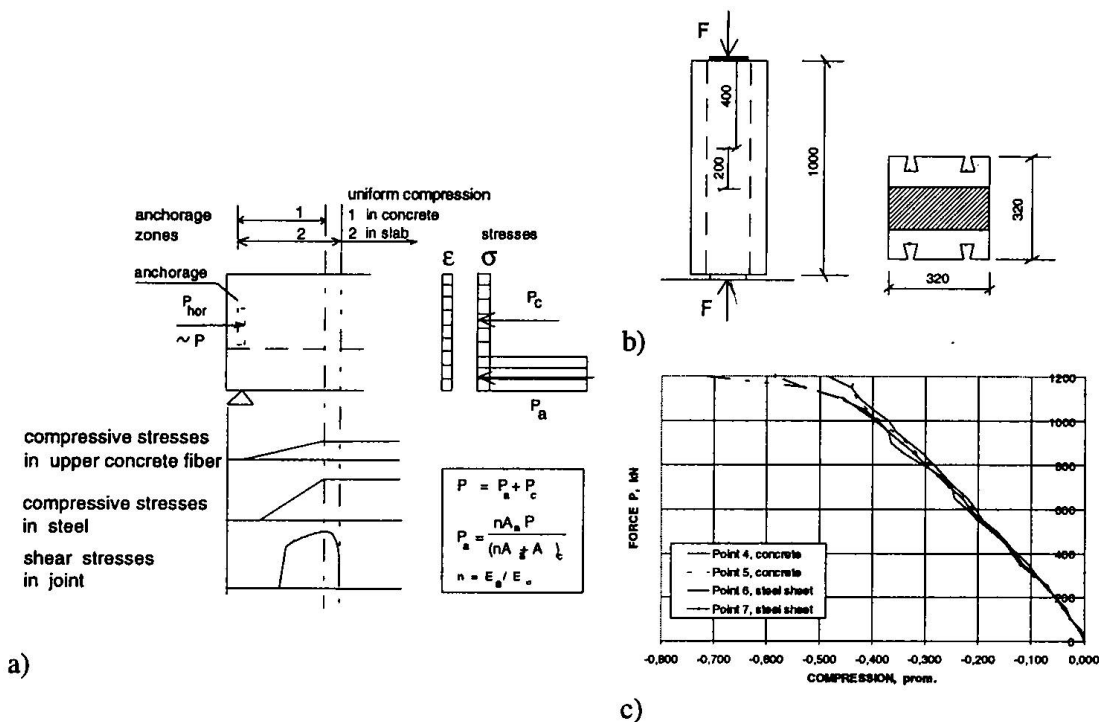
a) Schematical presentation of transfer of tendon force in the concrete and steel sheeting. b) Compressive tests on short columns c) Results from a compressive test on a short column.
